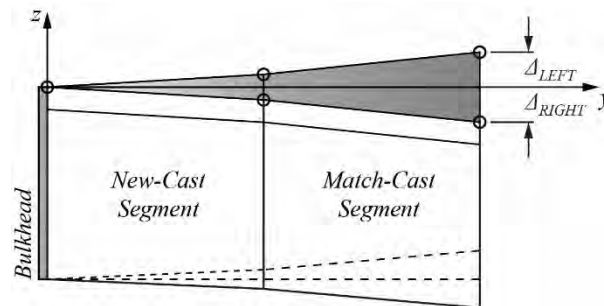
Casting Cell Horizontal Alignment—Radial Joints
